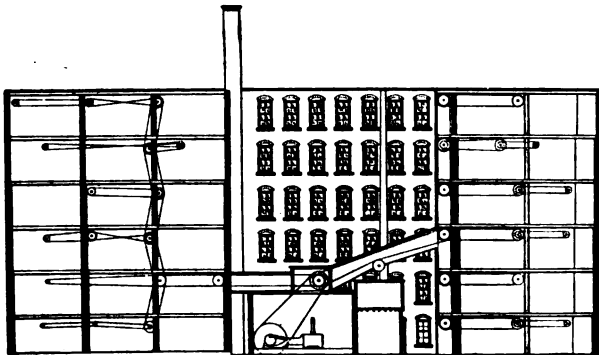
SECTION OF BUILDING SHOWING BELT DRIVING.
